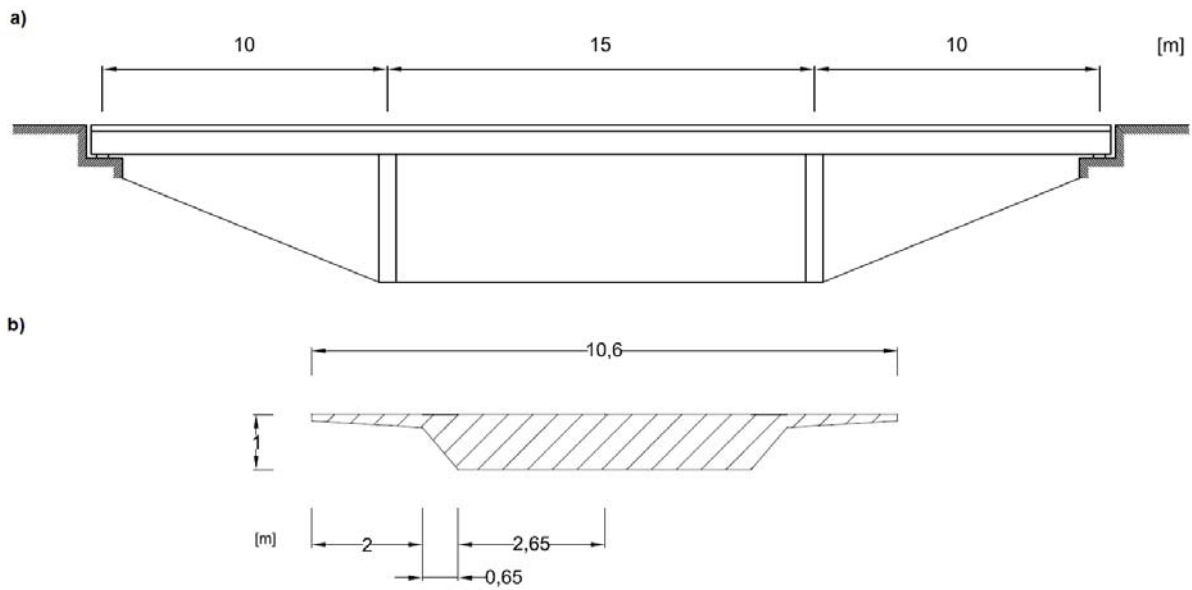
Standard bridge dimensions assumed for the calculation of the load cycles range input – a) elevation; b) cross-section
